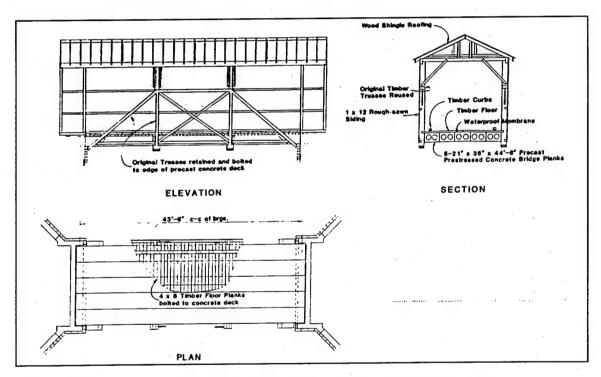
Restoration plans for Jediah Hill Covered Bridge (from PCI 1982)
